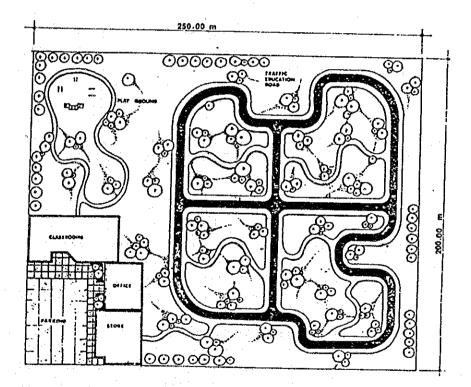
Conceptual Plan of Traffic Safety Park
